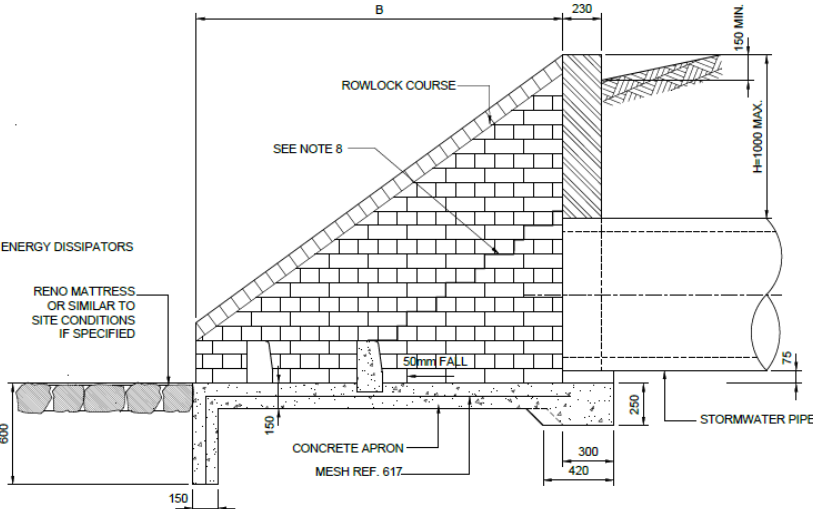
5 Typical Stormwater Headwall with Energy Dissipators
